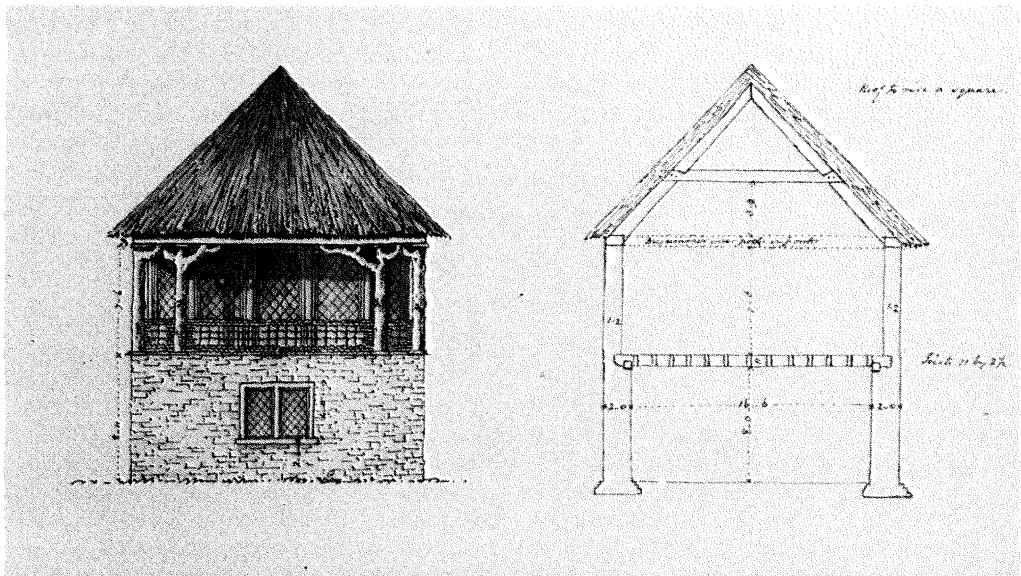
Elevation and cross section of a gazebo or summer house, inscribed 'Mr Geo Ward / I of Wight'. George Repton. Museums, Art Gallery and Royal Pavilion, Brighton.
